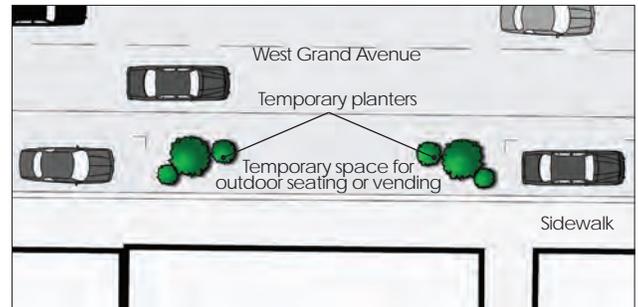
Temporary mid-block bulb-out illustration, bulb-out can be created with planter boxes, removable fencing, or other barriers
